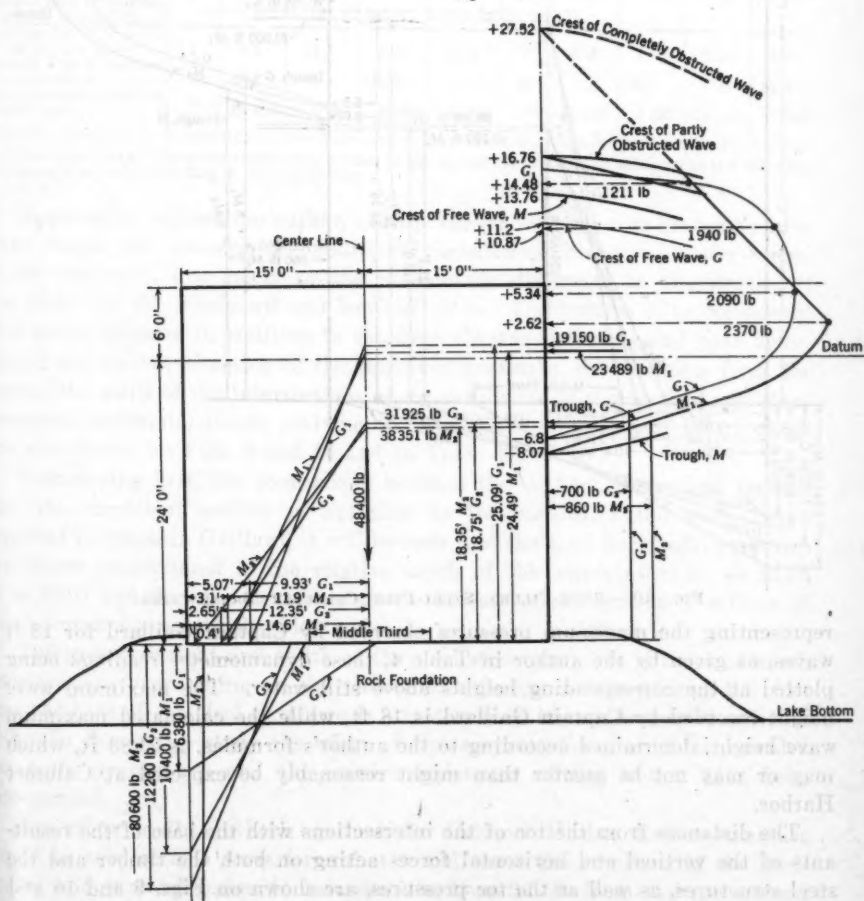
ROCK-FILLED TIMBER CRIB BREAKWATER.
